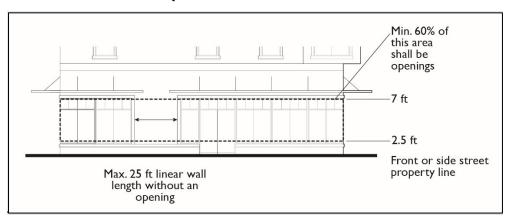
REQUIRED OPENINGS FOR NON-RESIDENTIAL USES
